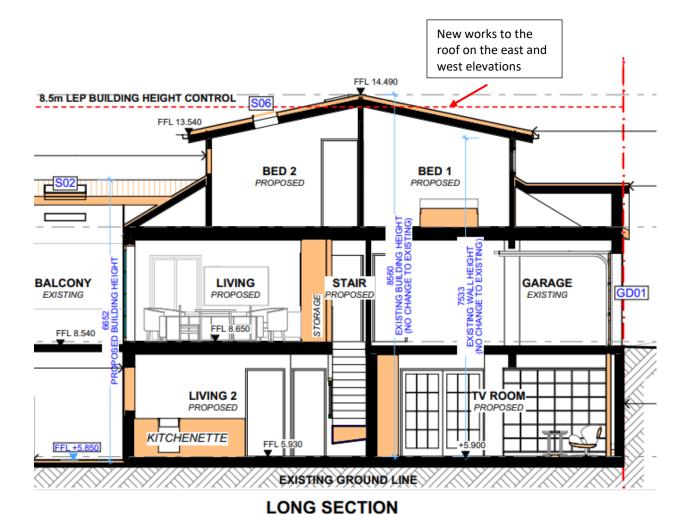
Extract from Architectural Drawing DA13, showing the proposed maximum building height
